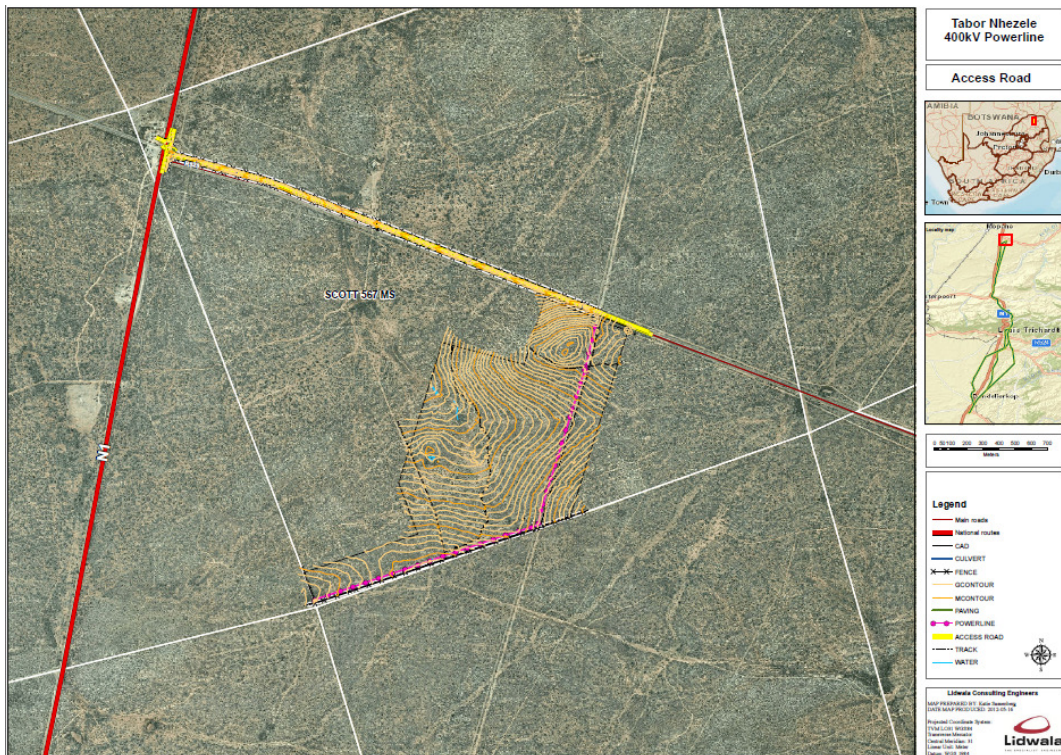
Proposed formal access road to the proposed new Nzhelele substation
